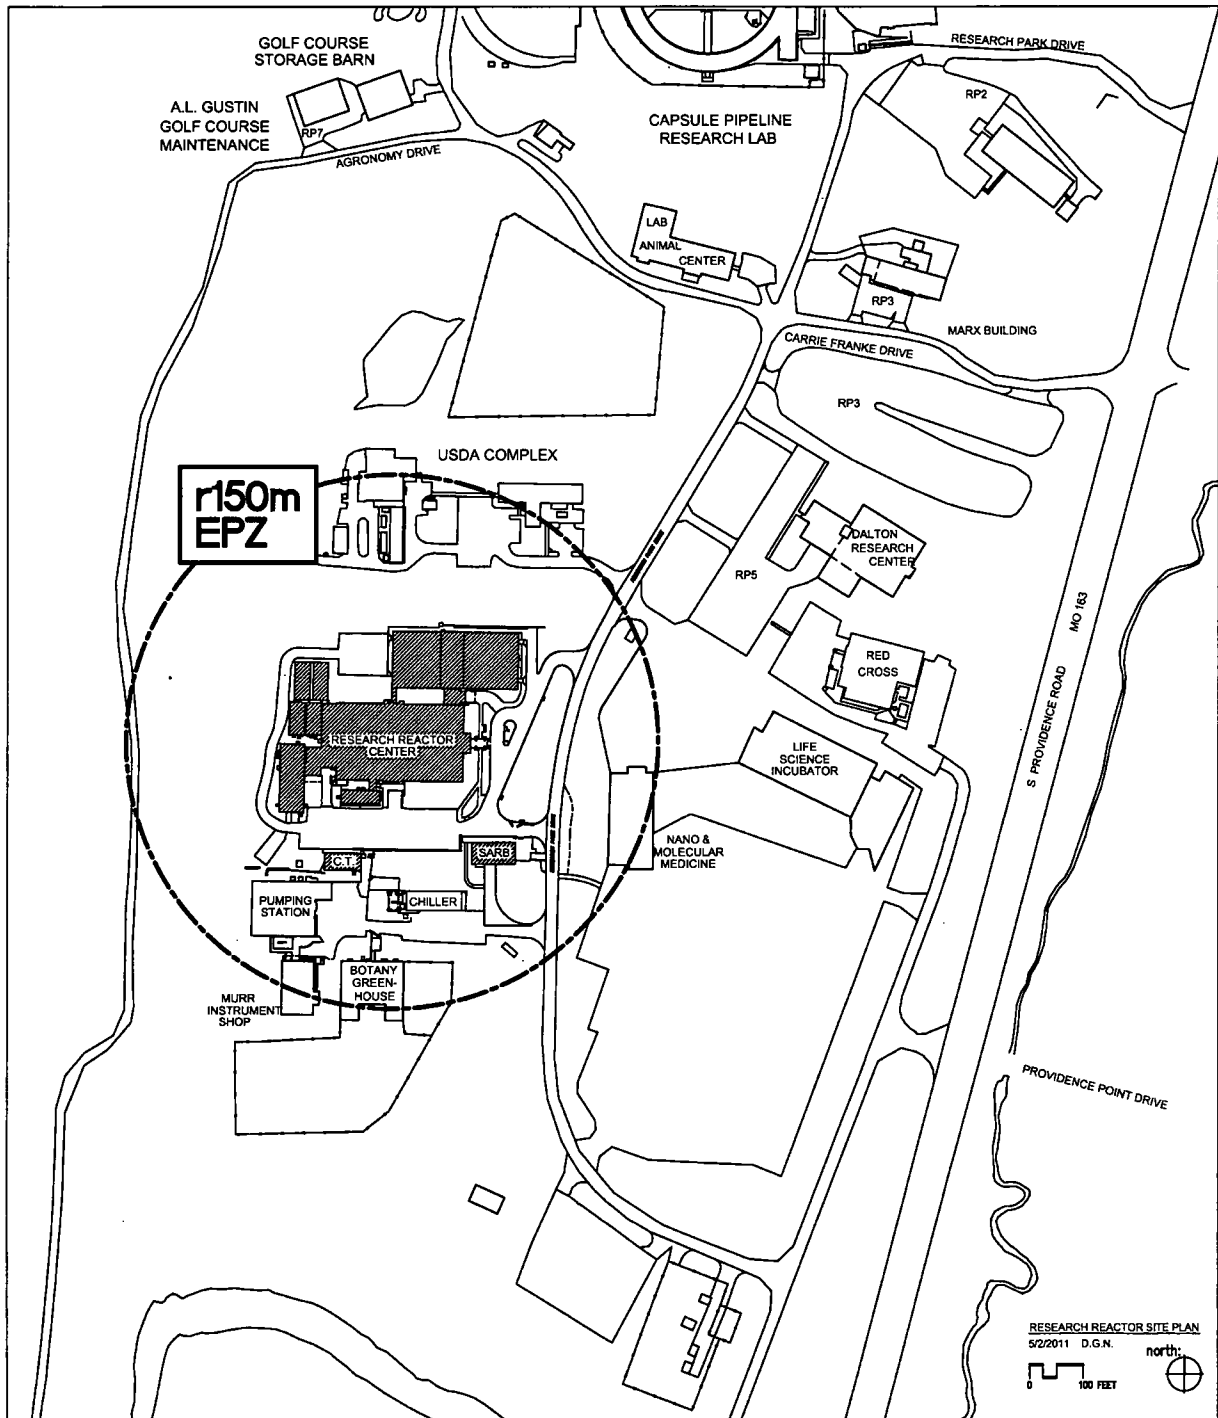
MURR Emergency Planning Zone and Surrounding Site Area
